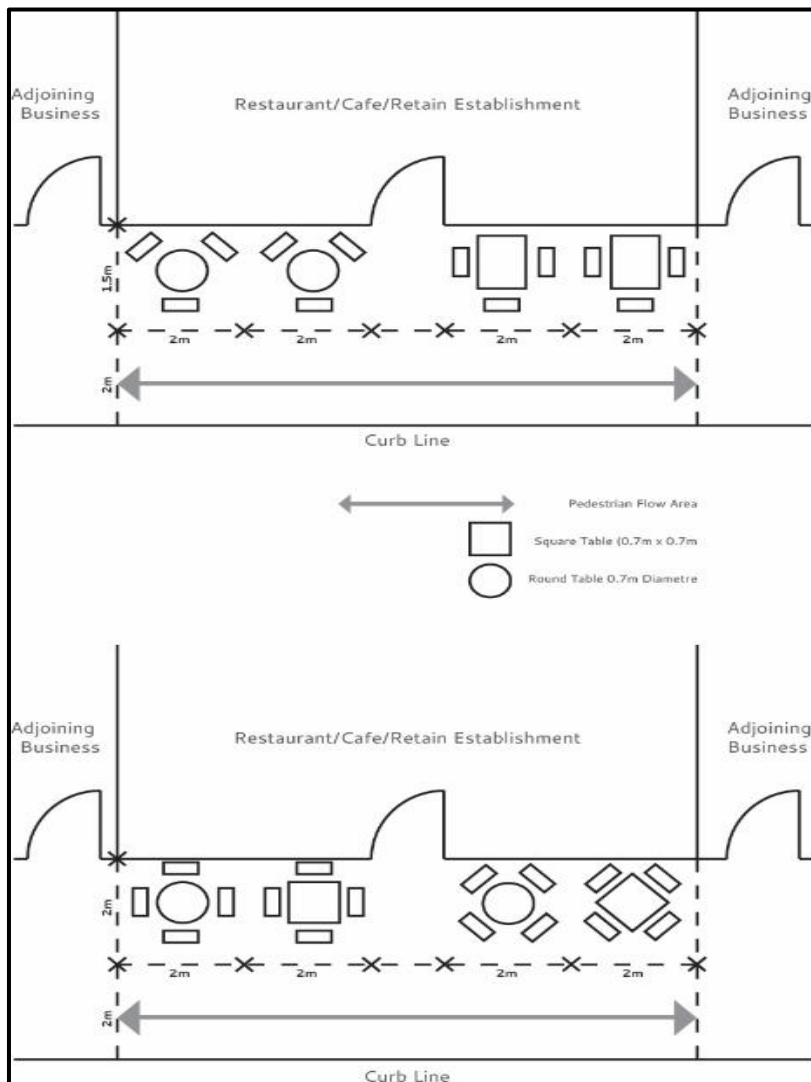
EXAMPLE SIDEWALK CAFE SEATING PLAN
